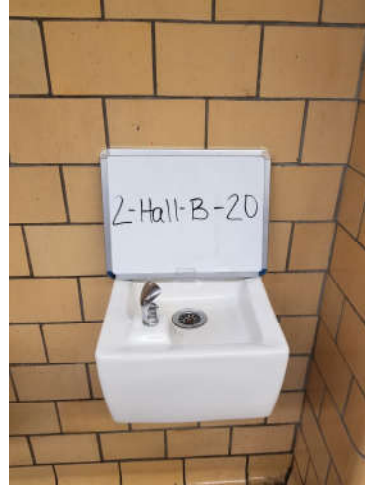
Bubbler, located on the 2nd floor next to room 206.
